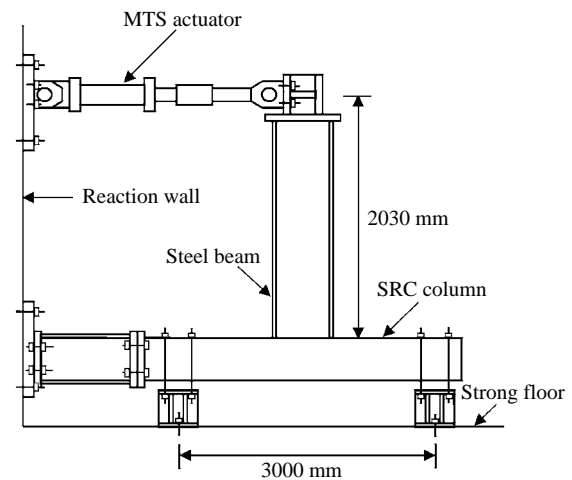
Test setup of the steel Beam-to-SRC column connection in the lab
